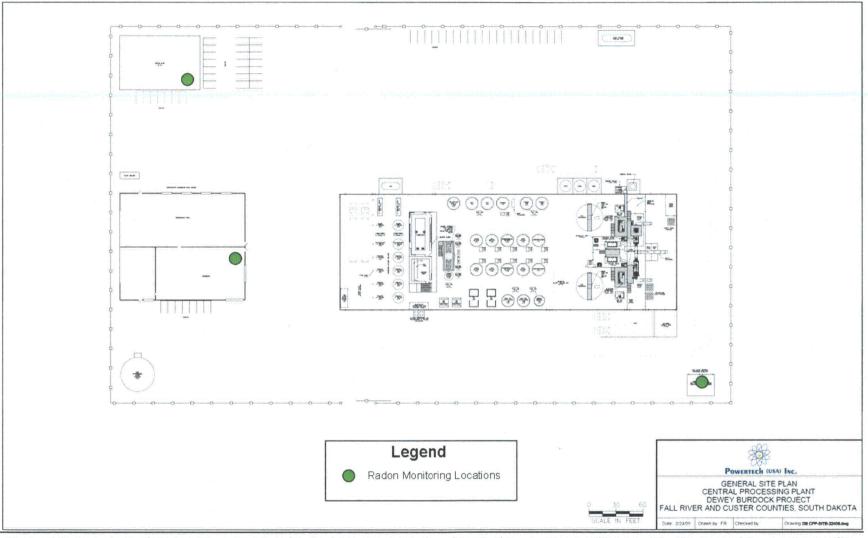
Locations of Radon Decay Product (Radon) Monitors on-site of Central Processing Facility, Outside the Central Processing Facility
